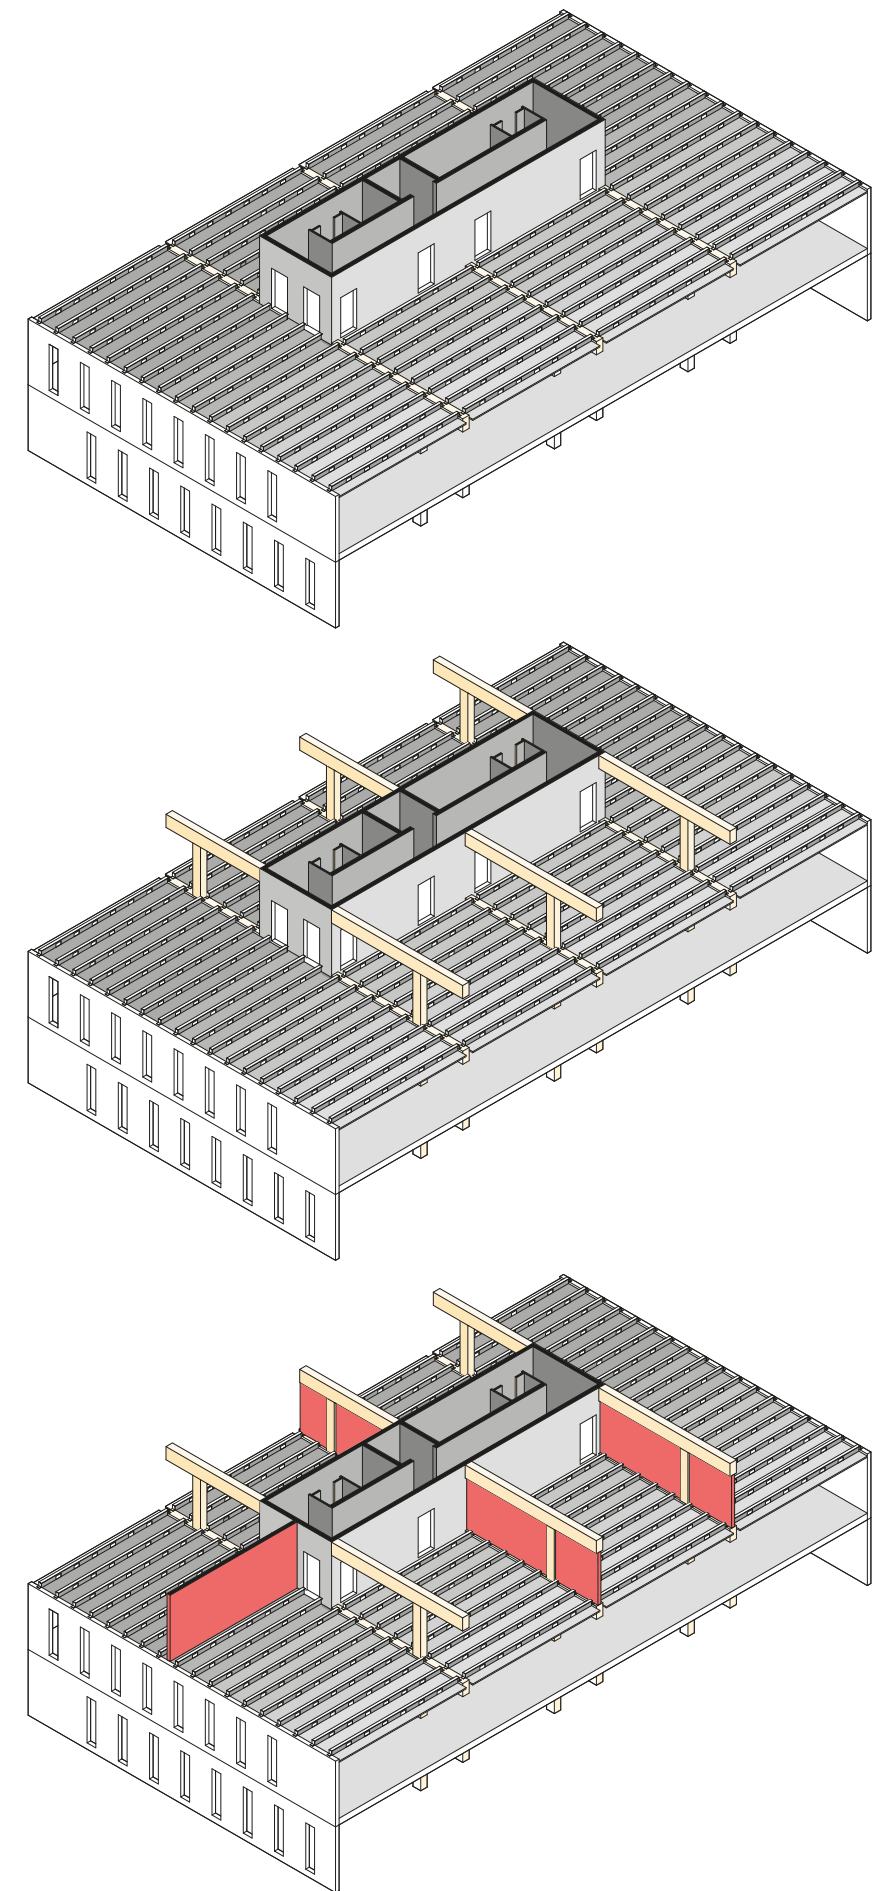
, 17, 18. Partition walls dividing the floor plan in multiple dwellings. (own work)
